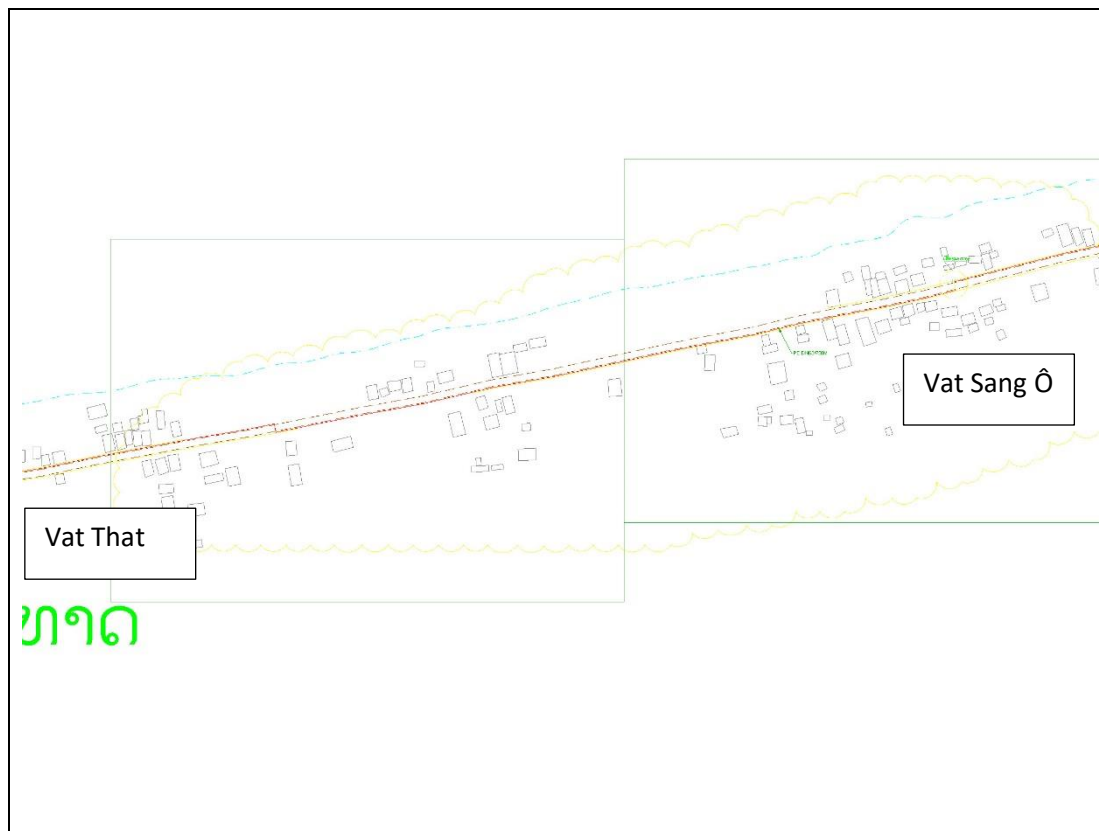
Pipeline installing from the Vat luangkao village, Vat sang oh and Sisumang big Buddha statue.
